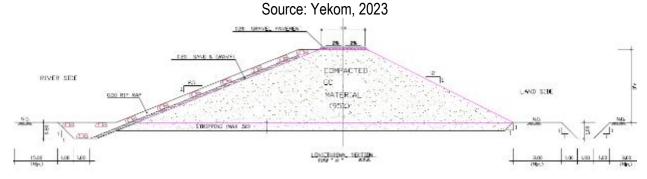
22: Typical section of the proposed rehabilitation and new construction dyke Mkondoa river Source: Yekom, 2023
